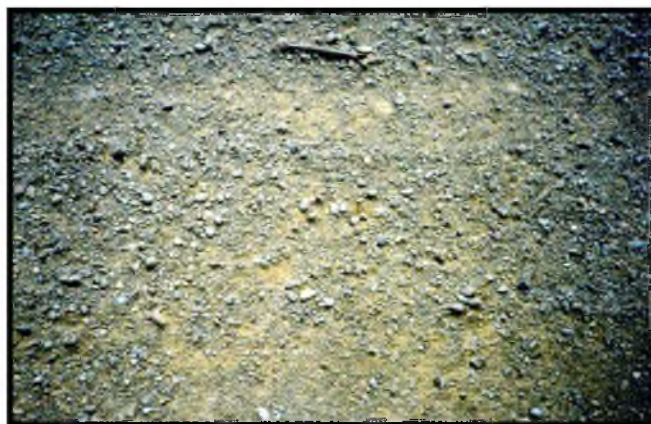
Raveling in an Unsealed Pavement (QDMR 1999)
